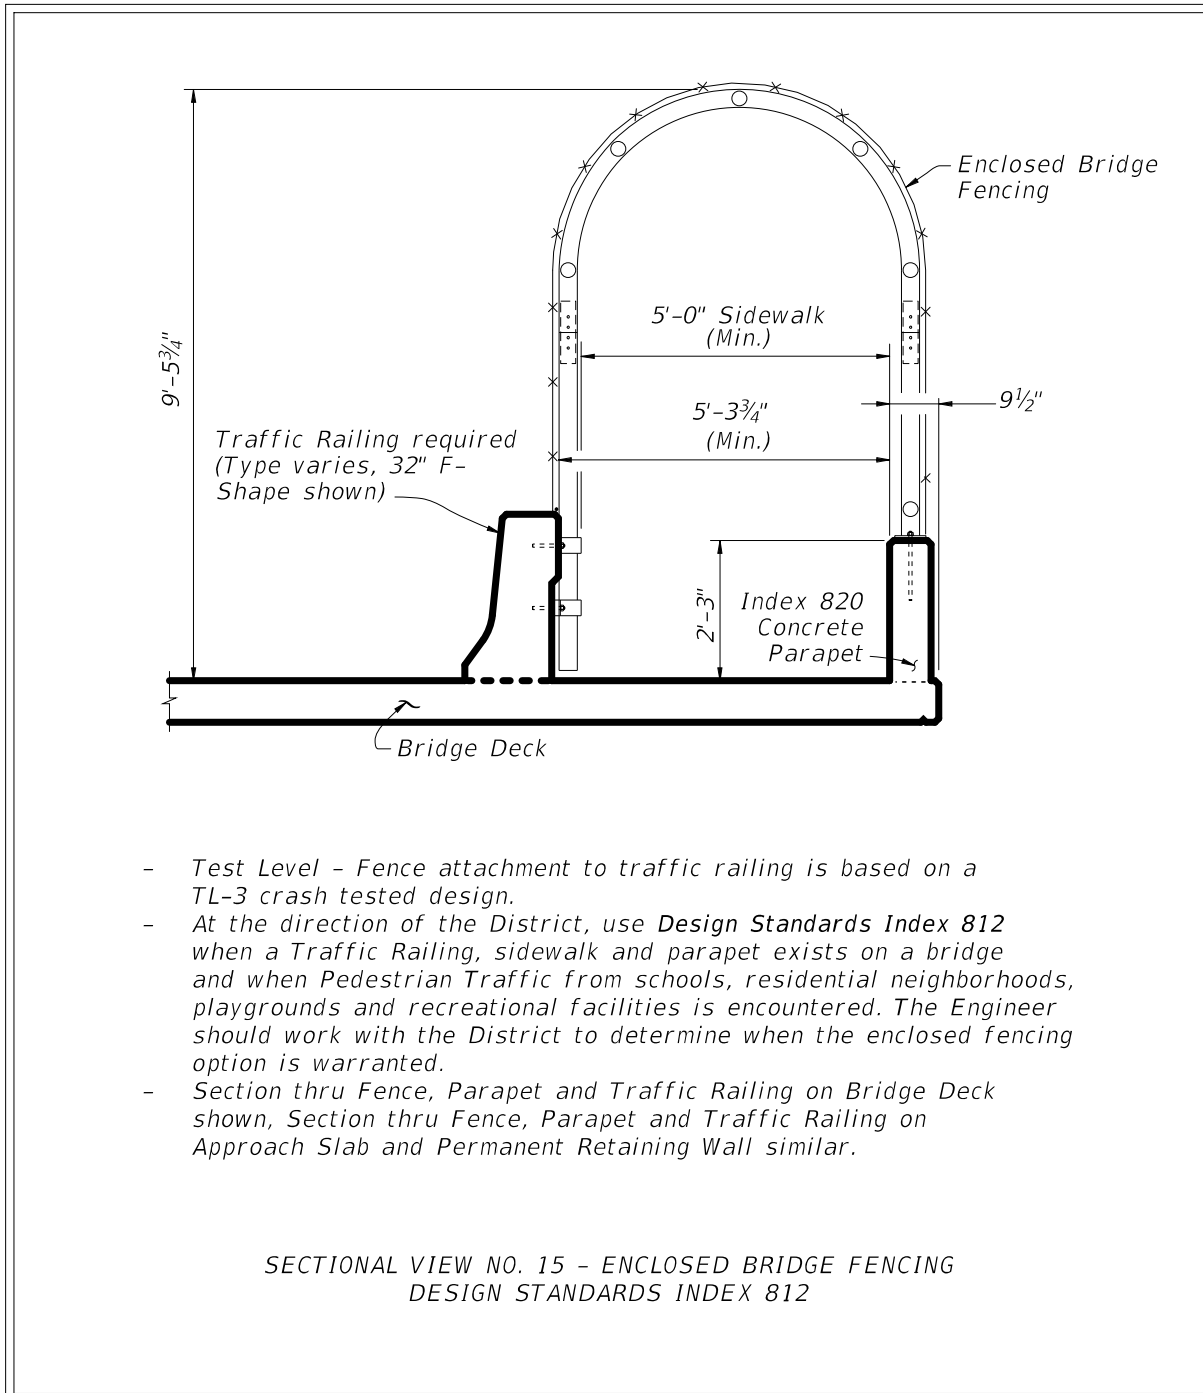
Bridge Railing – Enclosed Fencing
